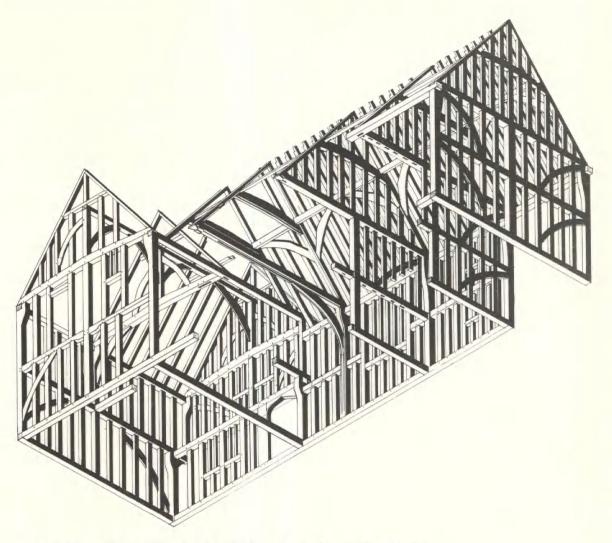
Sun House, Potton: isometric of frame viewed from back and below.
